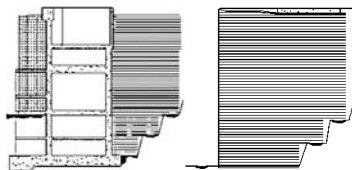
(left) Section 1 (crusher), (right) Section 2 (MSE wall).
